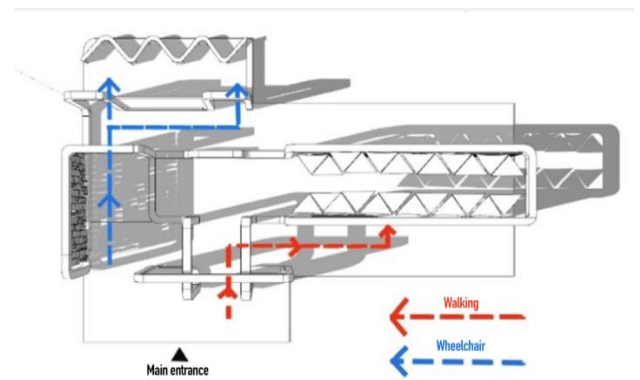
Master plan of "Exhibition space" in proposed design model on Thang Long sidewalk
